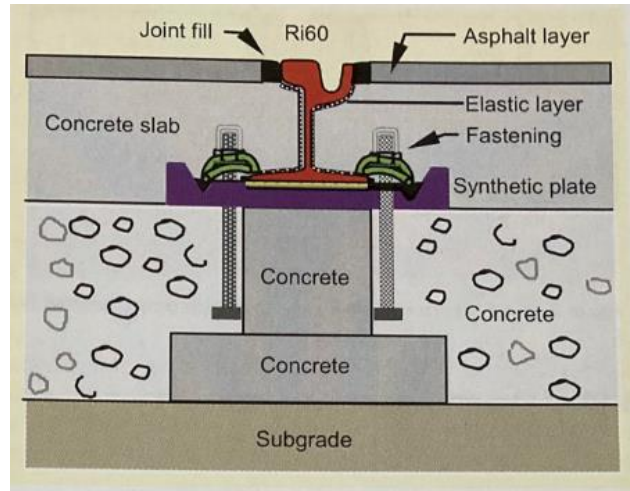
Embedded slab track (Source: (Profillidis, 2014))
